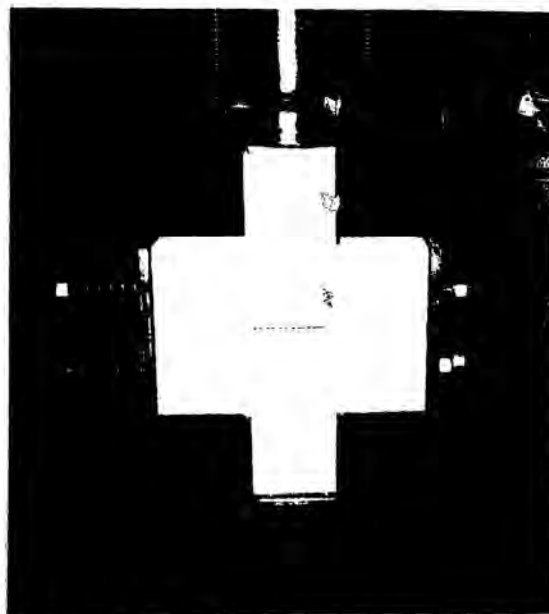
Construction of Model Joint Shear Test Specimens
